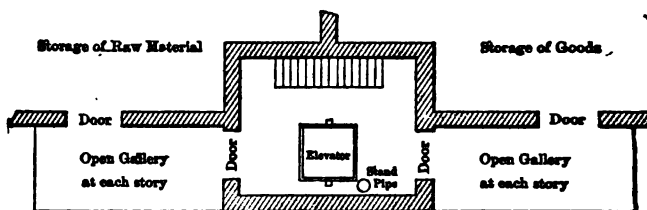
Stairway-tower and Galleries at Side of Storehouse
